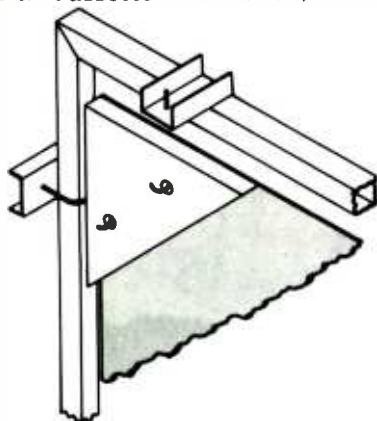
Corner detail, showing triangular reinforcement plate welded in place.
